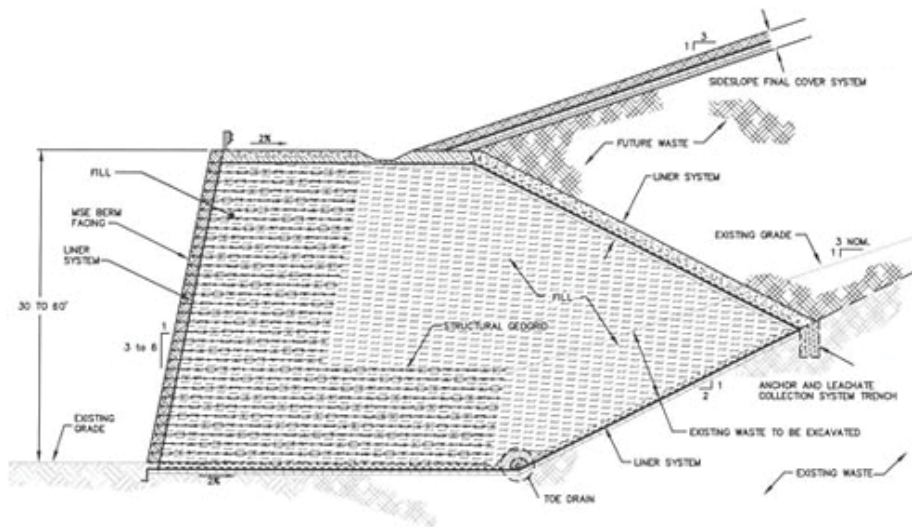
Sample sectional diagram of Advanced Wall Technology's patented MSE berm system.
